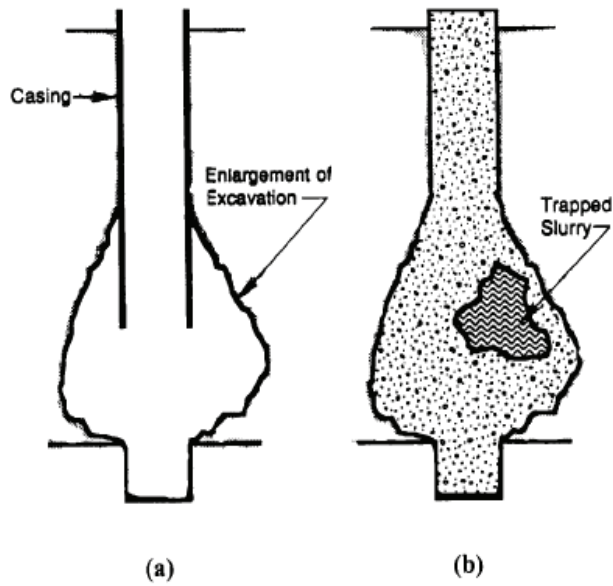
Placing Concrete where Casing was Improperly Sealed
